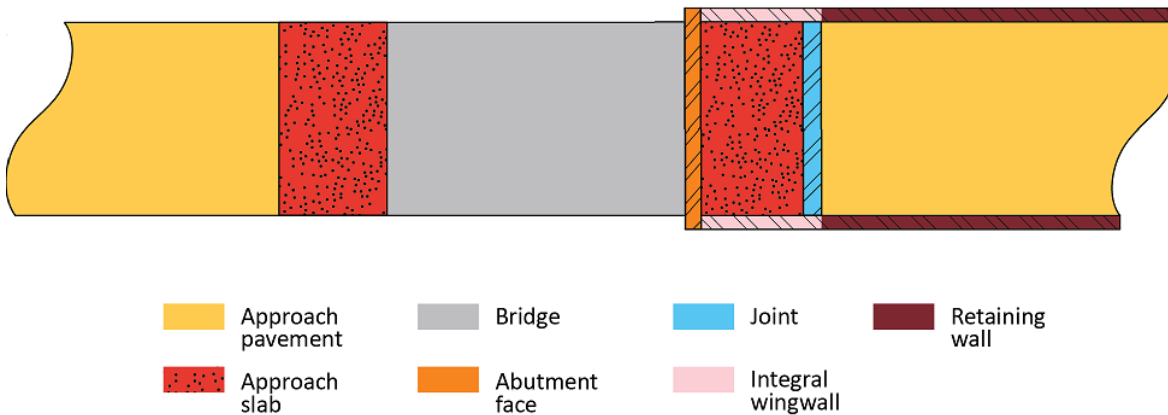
Diagram indicating where retaining walls differ from bridge abutments and wingwalls
